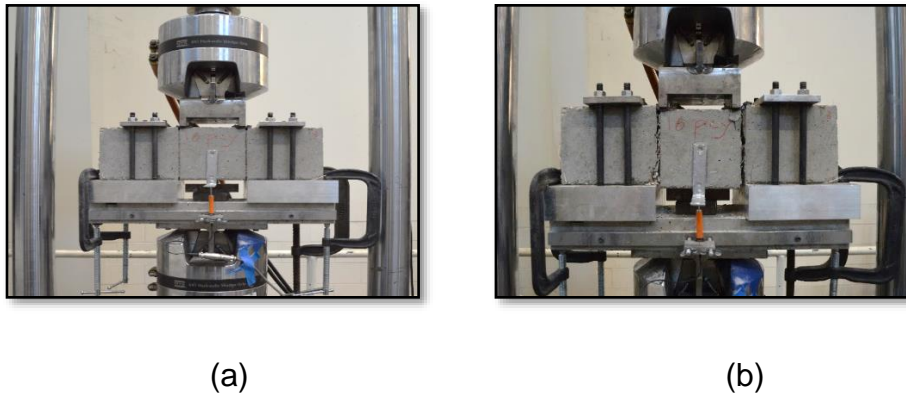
(a) Test setup for direct shear test and (b) Fractured specimen
